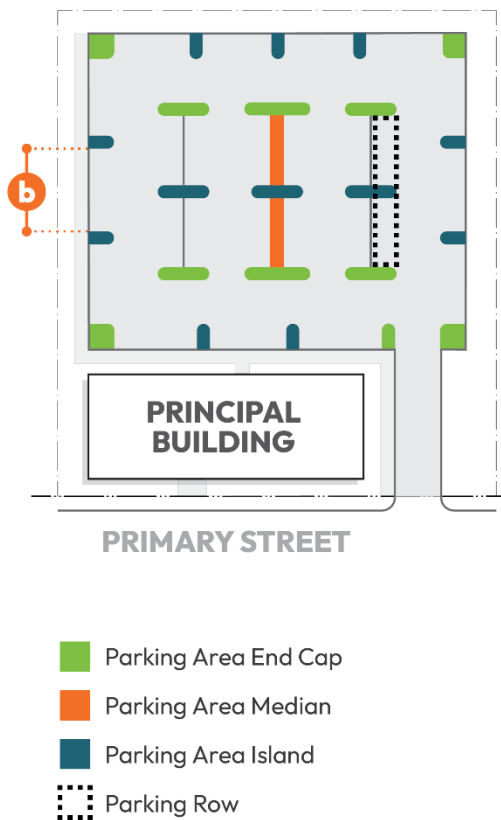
Off-Street Parking Areas in Rear of Principal Building
